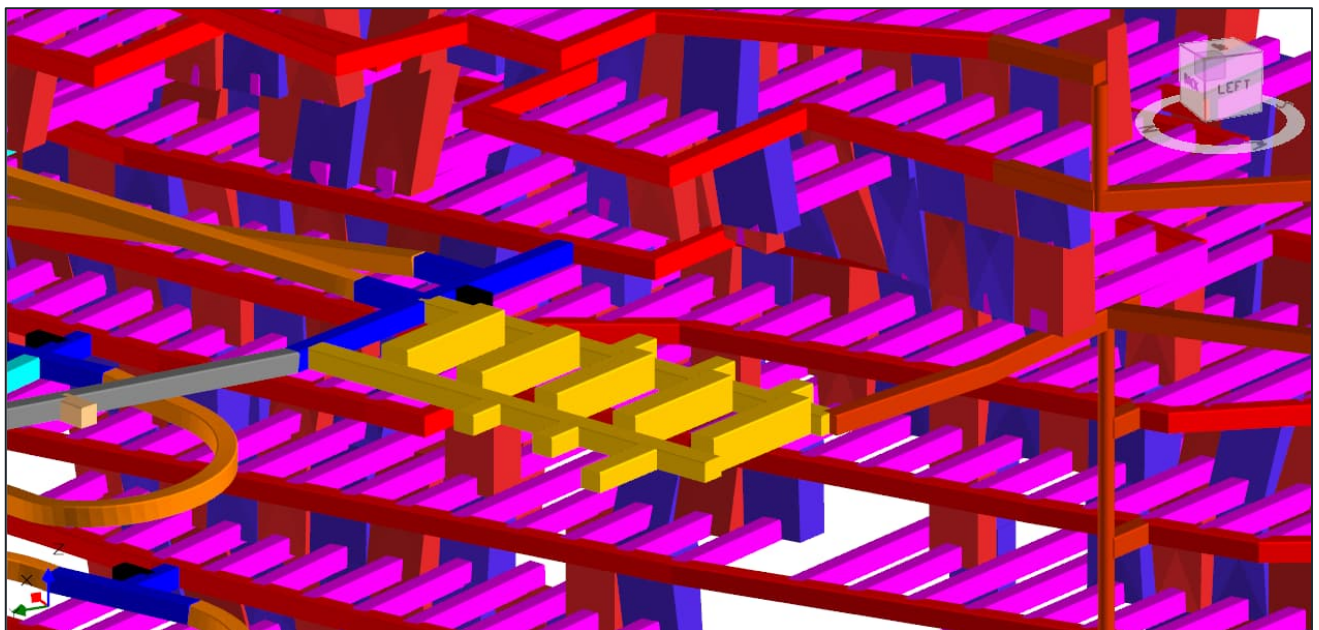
Underground Maintenance Workshop on -140m Level
